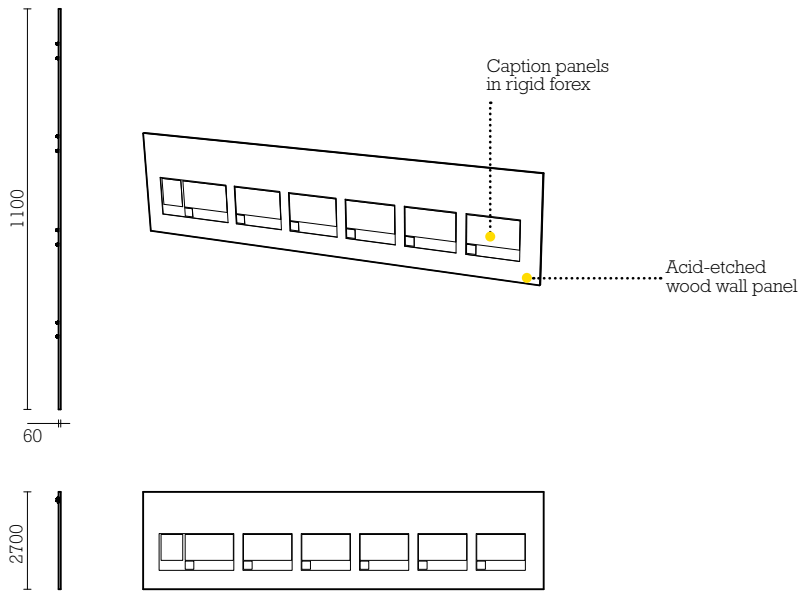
Construction detail - Wall display panel | Axonometric view and dimensioned elevation.
